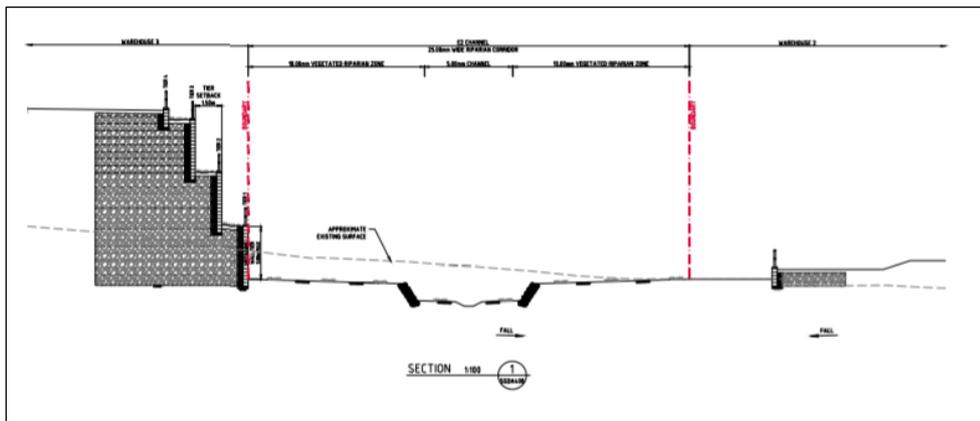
Upstream/ Eastern Cross-Section (From Drawing C013874.06-SSDA460 - Typical Sections - Sheet 1 - from Appendix K – Civil Drawings)
